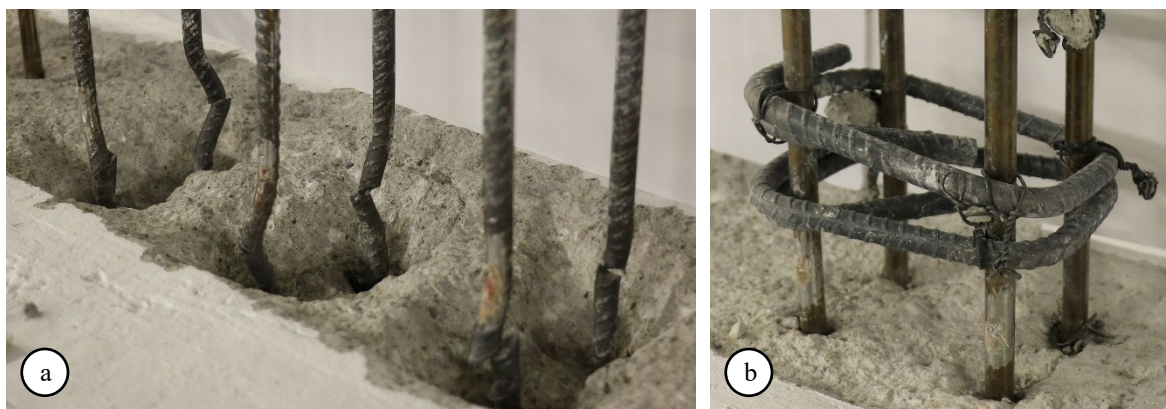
Post-testing condition of longitudinal reinforcement at the base of Wall SWN:
